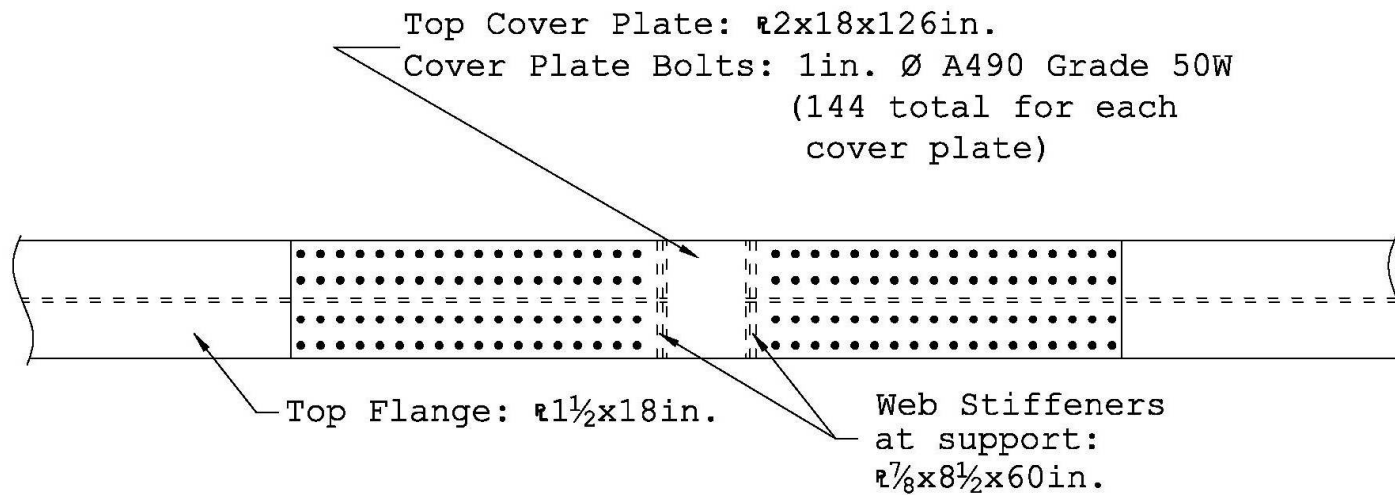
Elevation and Plan Drawing of Massman Drive Bridge
